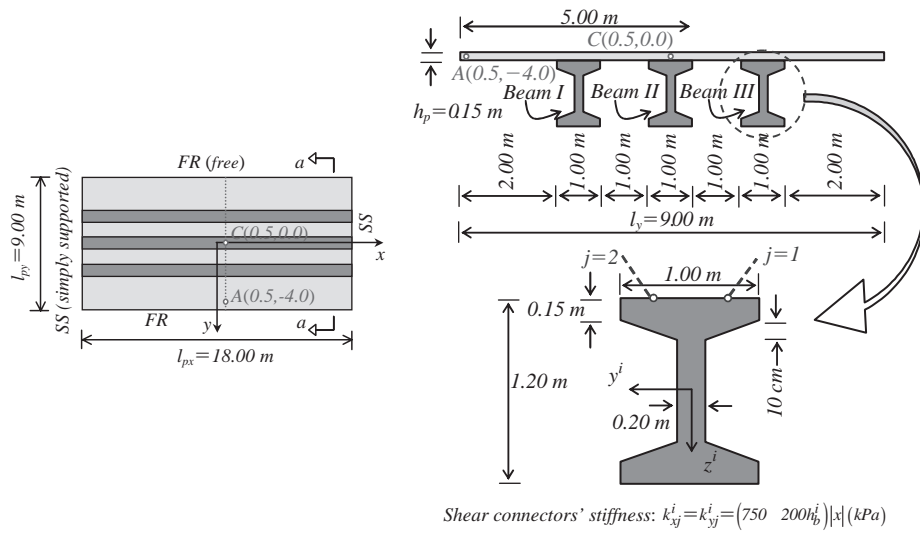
Plan view and section a-a of the stiffened plate of Example 2.
